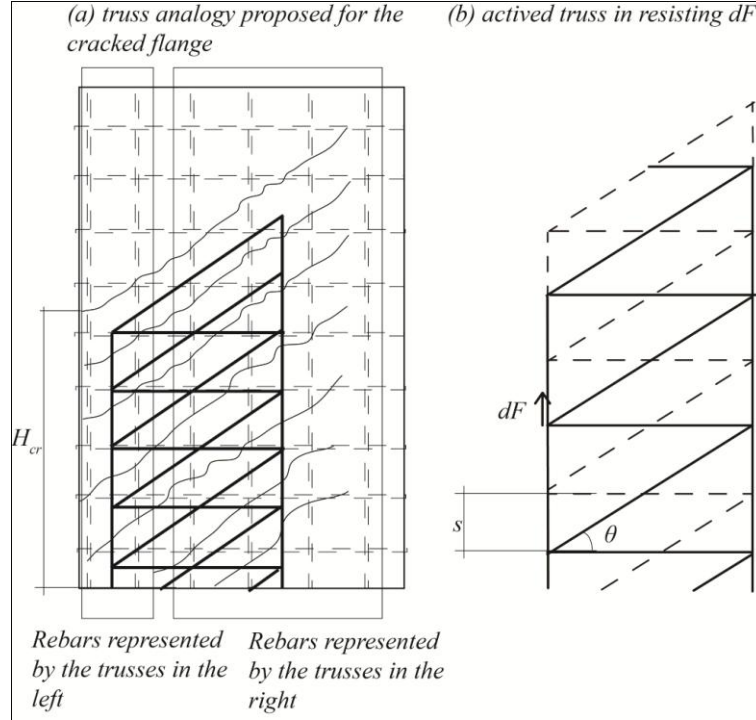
Proposed truss analogy for the cracked concrete and the mobilized force by an individual  $dF$
